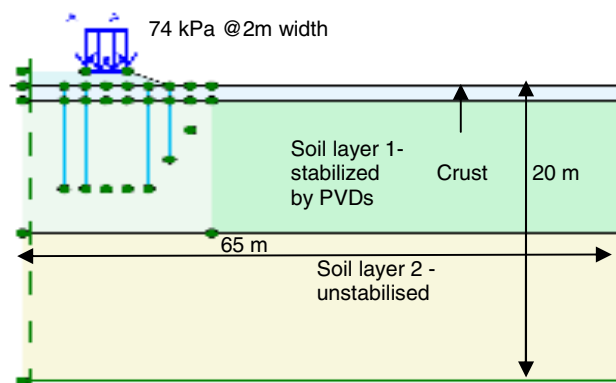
Vertical cross section of track and formation (Indraratna et al., 2006a)
